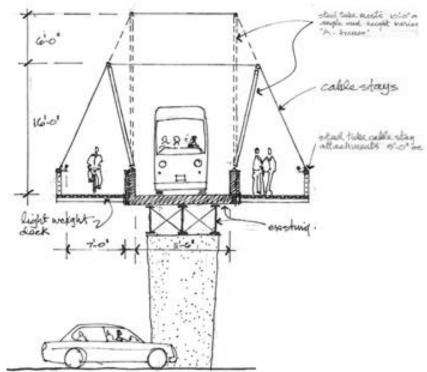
Typical Section, Widening Existing Bridge by Use of Cable-Stayed Structure
